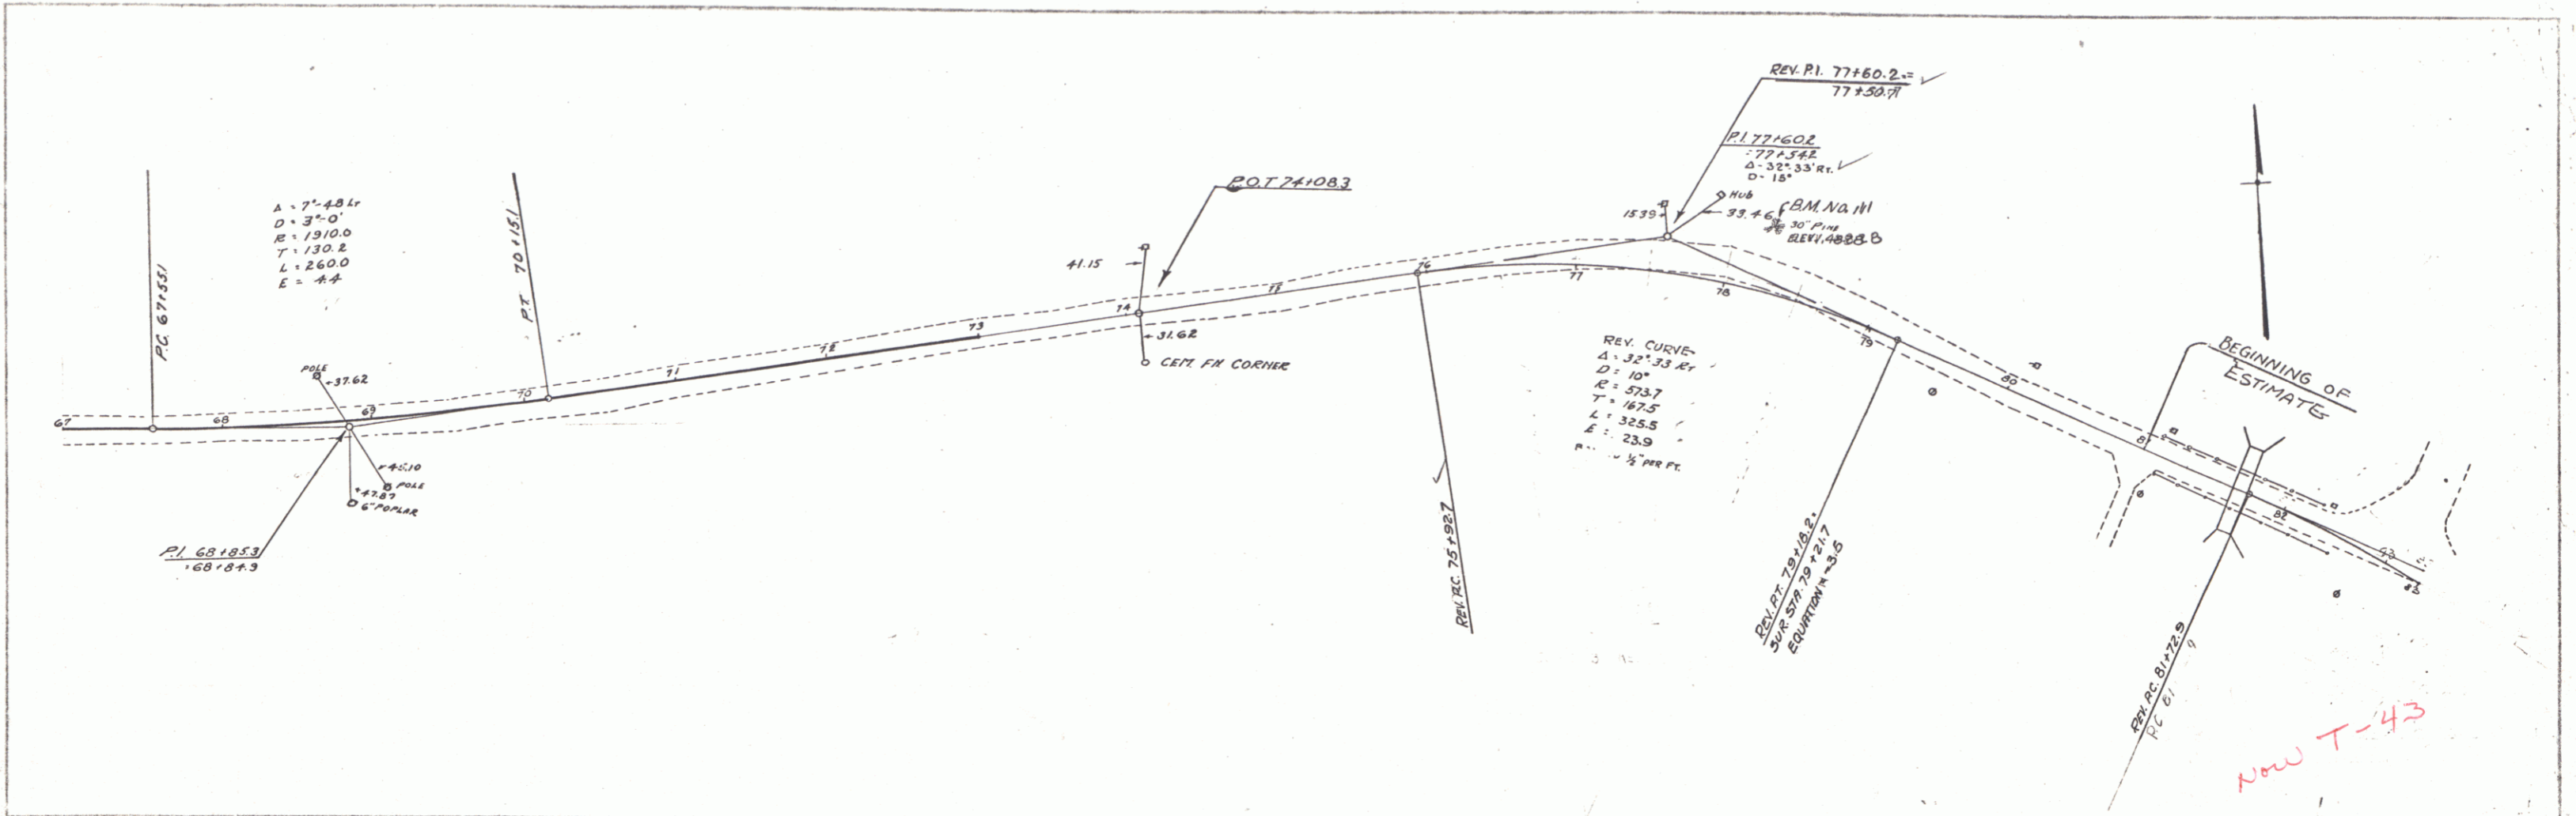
PLAN PROFILE - C. P. & A. P. ENGINEERS
